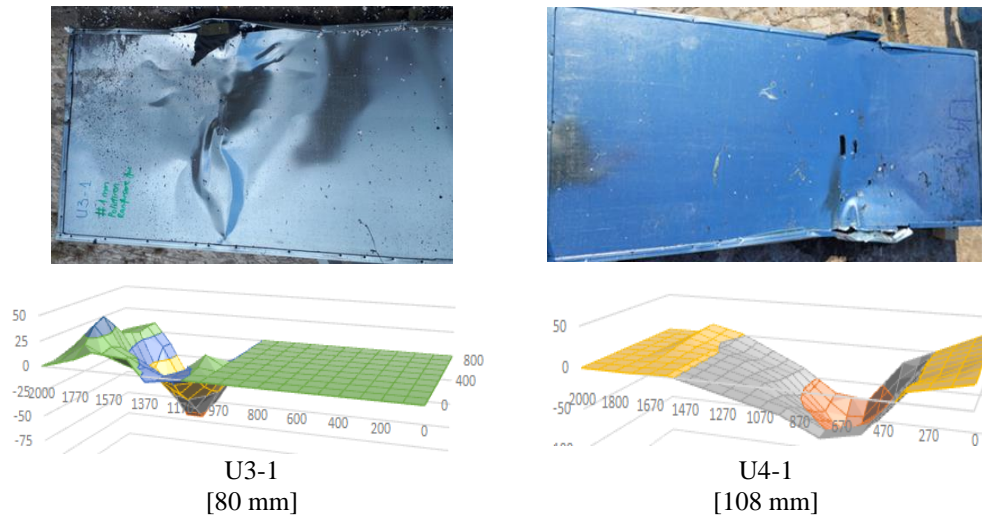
Deformation of door leaves for specimens U3-1 and U4-1
